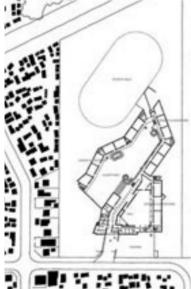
(b): Plan of the Inkwenkwezi Secondary School by
